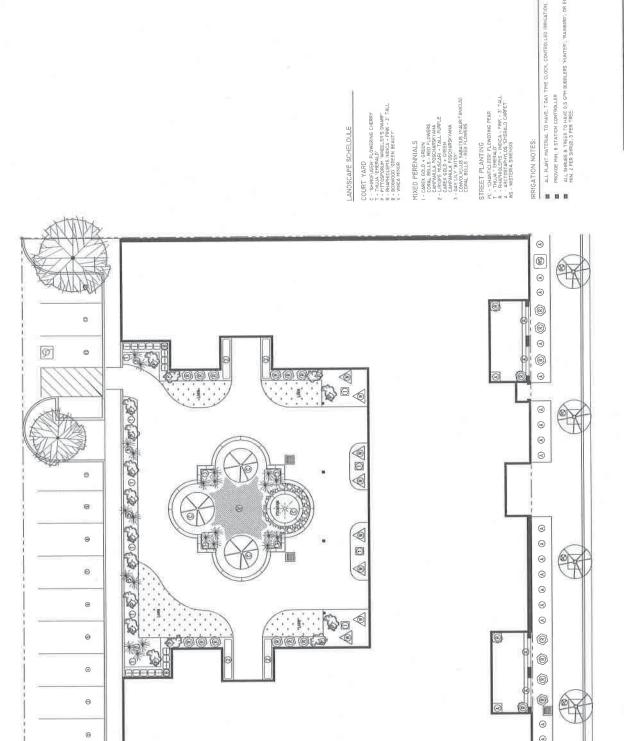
Exhibit E Landscape Plan CUP 13-006 (Tucker Res. Care)
